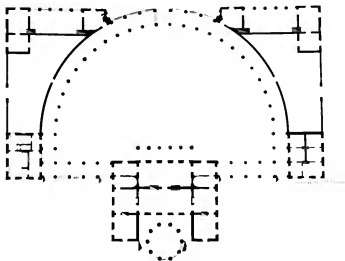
, PLATE 35. Plan of a palatial building with rotunda and portico
